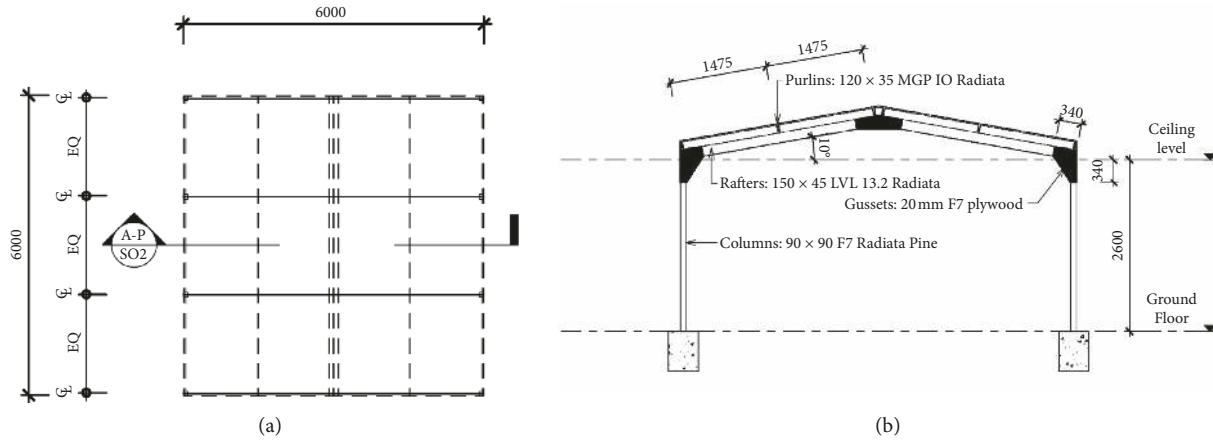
Portal frame case A. (a) Layout. (b) Cross section.
